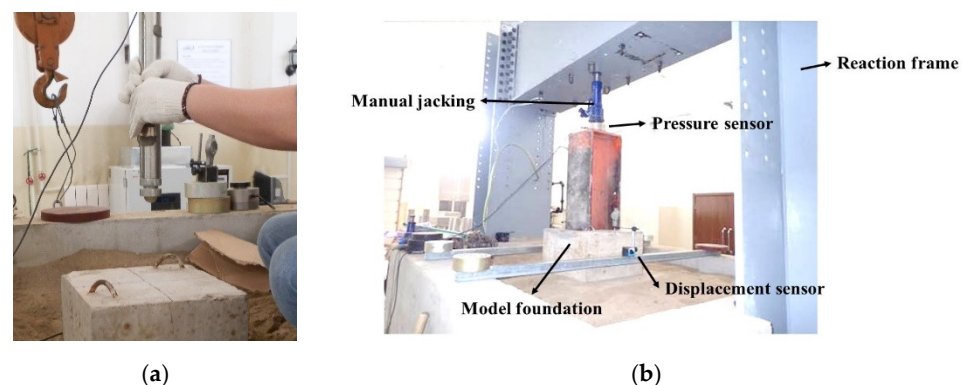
Test equipment: (a) impact steel bar; (b) equipment and sensors for the SLT.
